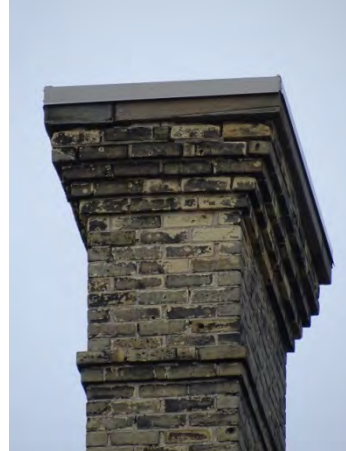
Central Administration Block – South West Chimney – South East Elevation Detail (Photo No. 72.3)
